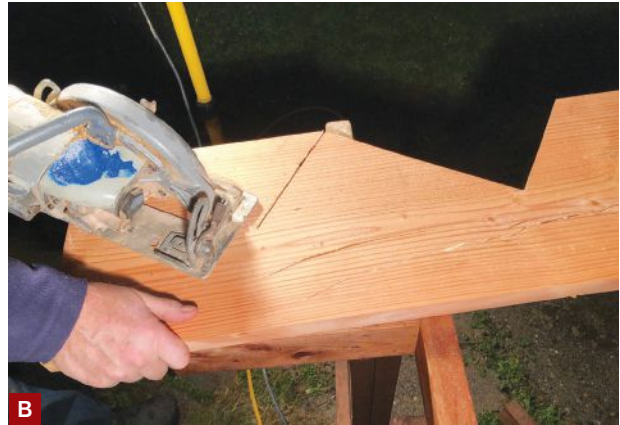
To avoid overcutting the notches, which would weaken the stringer, the author starts the cuts with a circular saw (A, B), and finishes the cuts with either a handsaw or a jigsaw (C). Marking the diagonal increments on the stringer before laying out and cutting the notches ensures that tread and riser dimensions vary by no more than $\frac{1}{8}$ inch (D).
